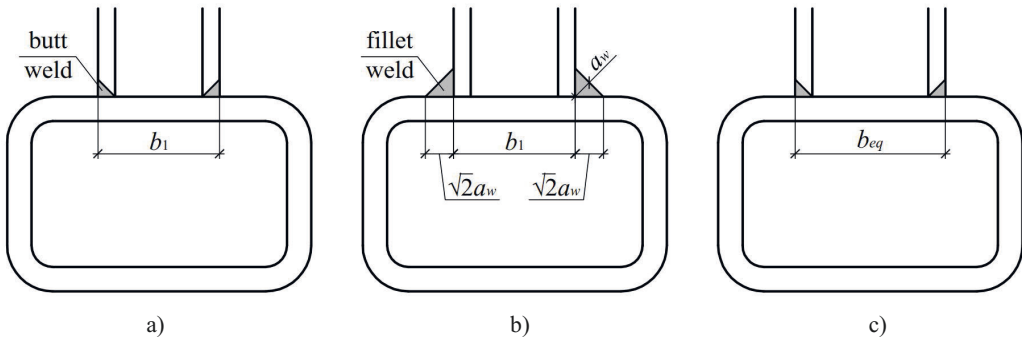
Idealization of welds: a) butt welds; b) fillet welds; c) equivalent joint with butt welds.
